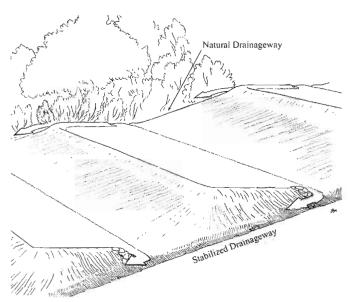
Earthen terrace overflow directed to both a natural drainageway stabilized with vegetation, and a constructed stabilized drainageway
